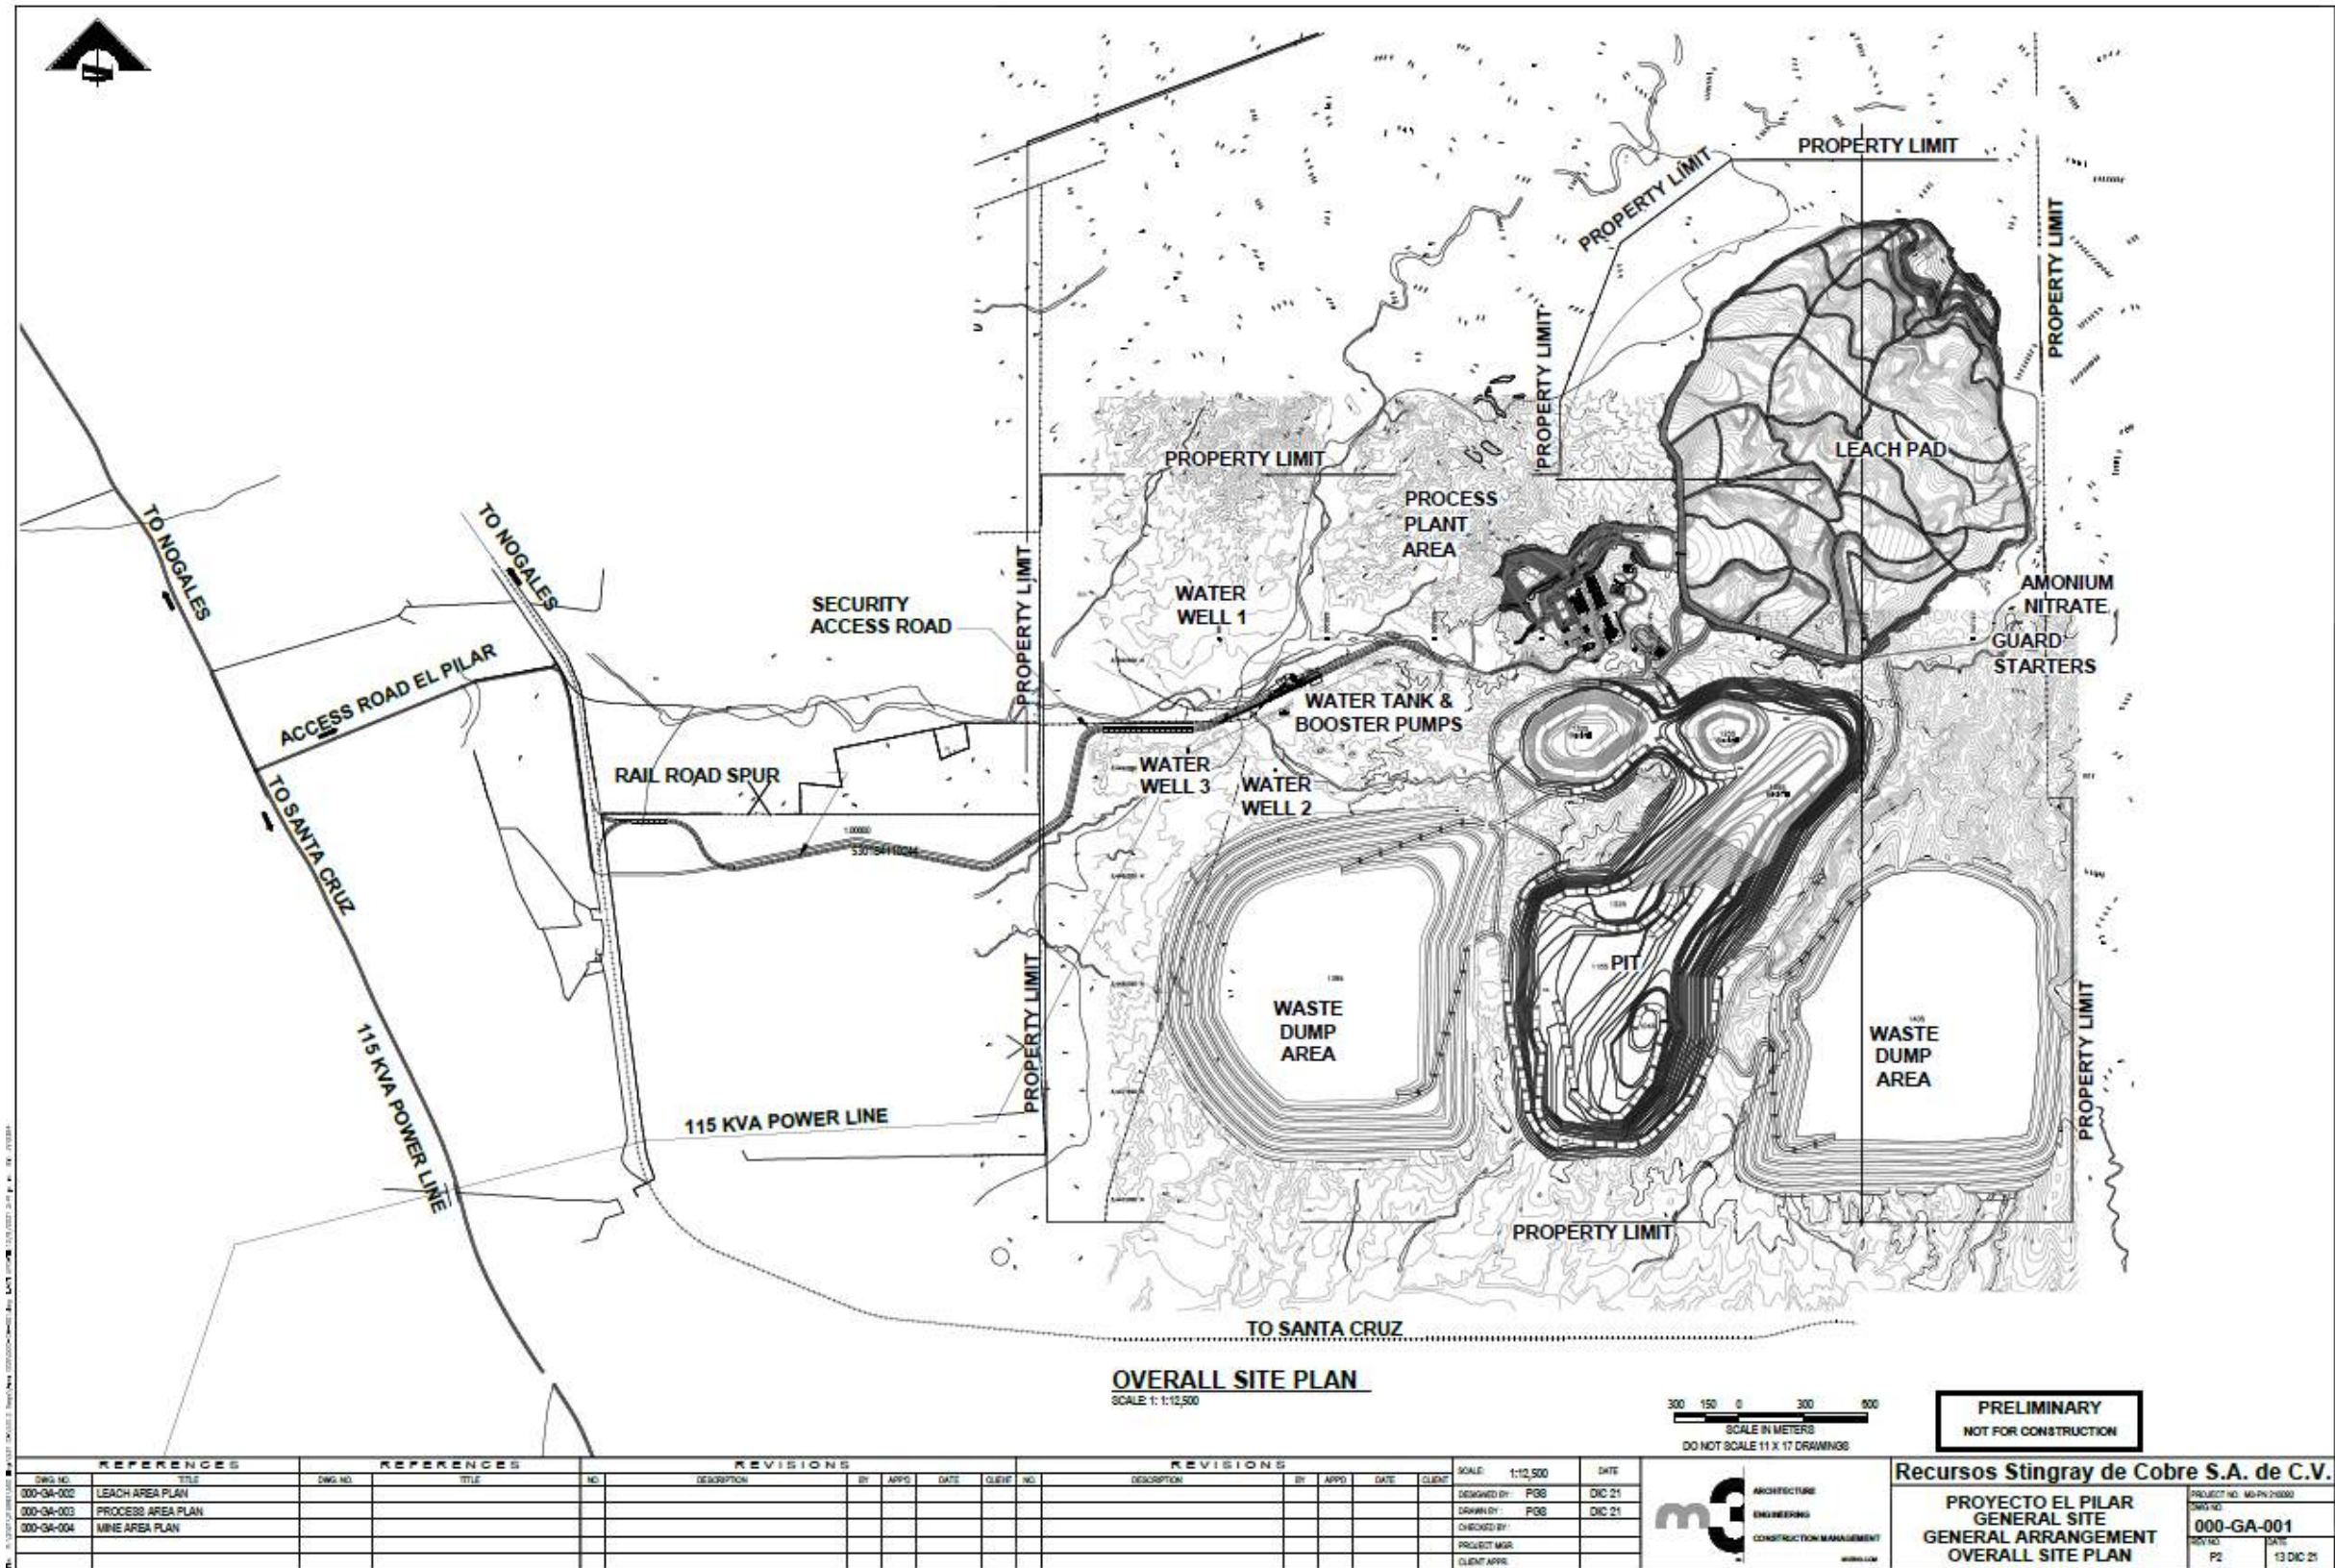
General Site Plan, 115 kVA Power Line, Railroad Spur and Access Road
